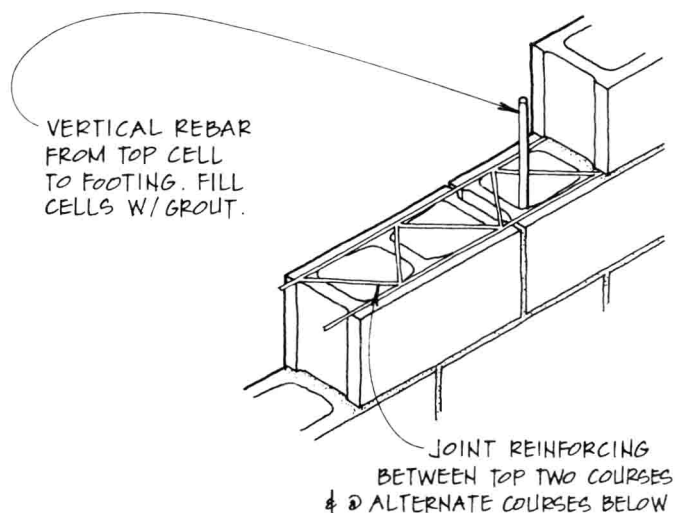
Horizontal CMU reinforcing can also be provided with wire trusses or ladders set in mortar joints.
